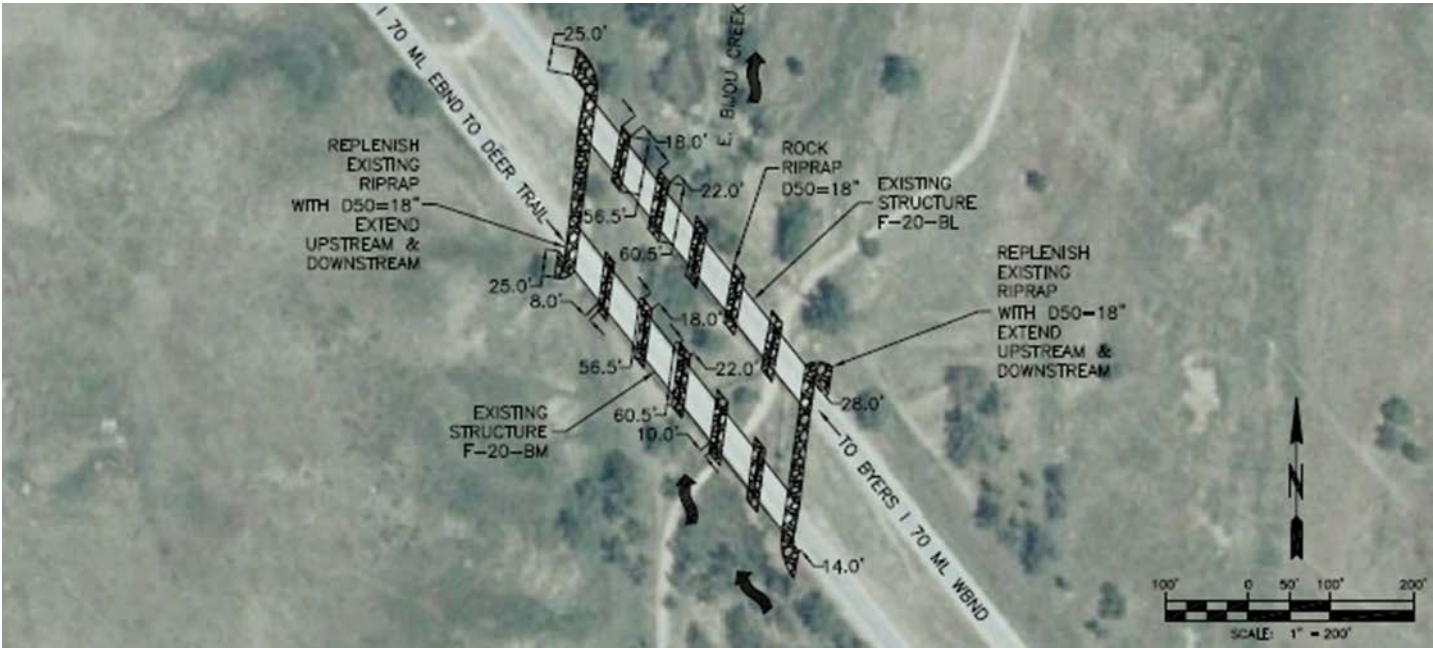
Plan view of Bridges F-20-BL and F-20-BM with recommended hydraulic scour countermeasure locations
